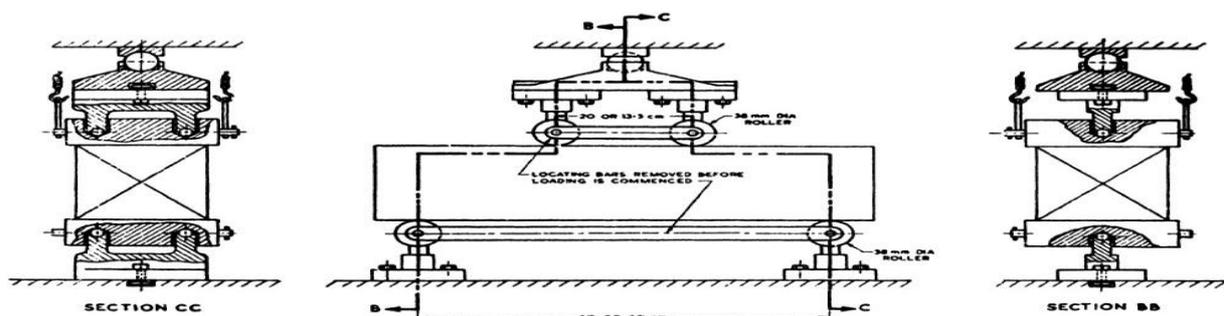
ARRANGEMENT FOR LOADING OF FLEXURE TEST SPECIMEN
